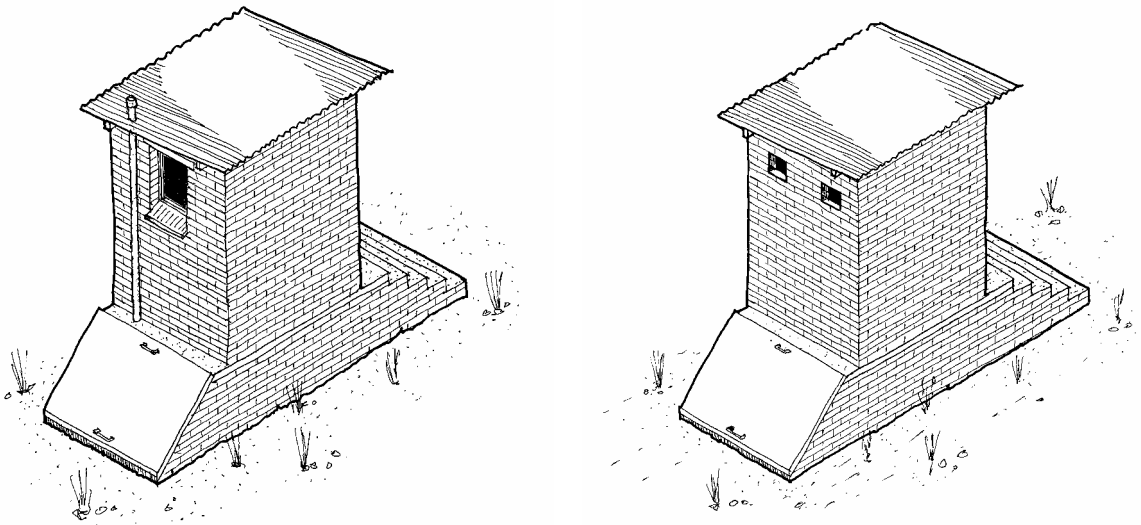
Typical examples of simple, easy to build UD toilet structures. As an alternative to conventionally built brick structures, some commercially available toilets are built with thin prefabricated concrete panels that are assembled on site (Drawing: MC Bolton).
